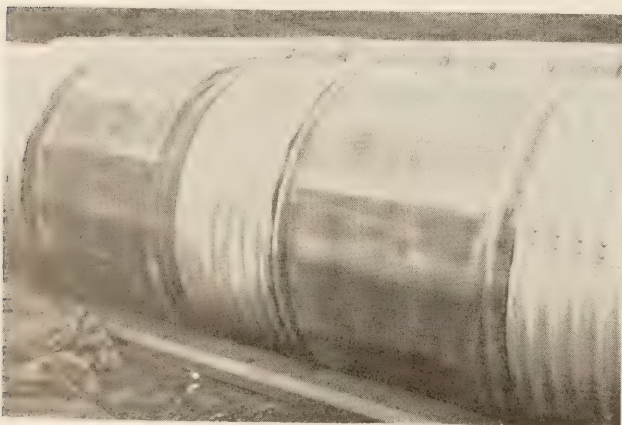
SECTIONS OF CULVERT PIPE ON WHICH RIBBONS HAVE BEEN INSTALLED AND COVERED WITH A PROTECTIVE RUBBER JACKET.
